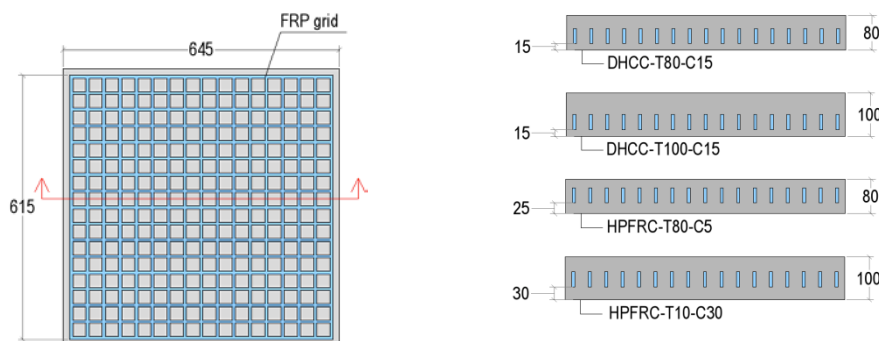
Manhole cover prototypes dimensions and cross-section in mm
